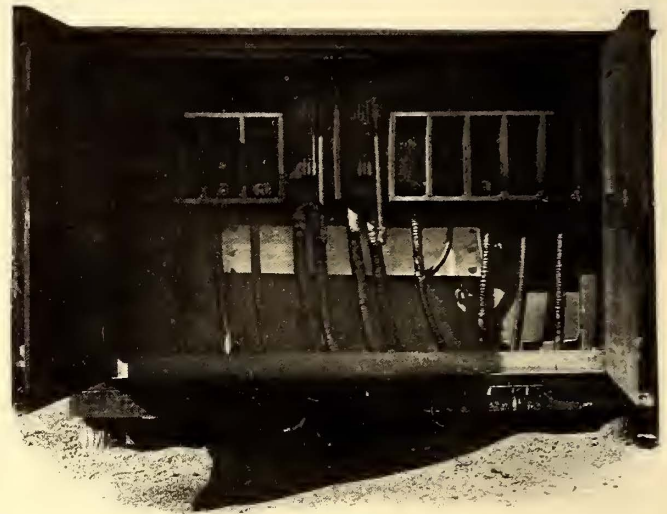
SWITCH AND FUSE HOUSE, CONTROLLING THIRD-RAIL SECTIONS IN YARD EAST OF JAMAICA
